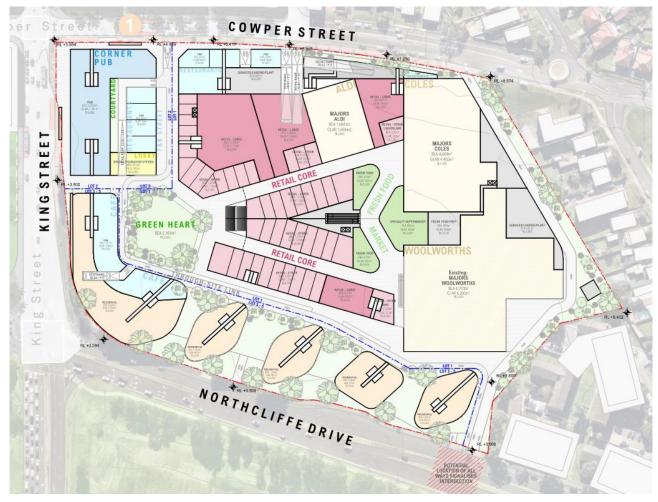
Plan of the proposed redevelopment of Warrawong Plaza (CHROFI 2023)
